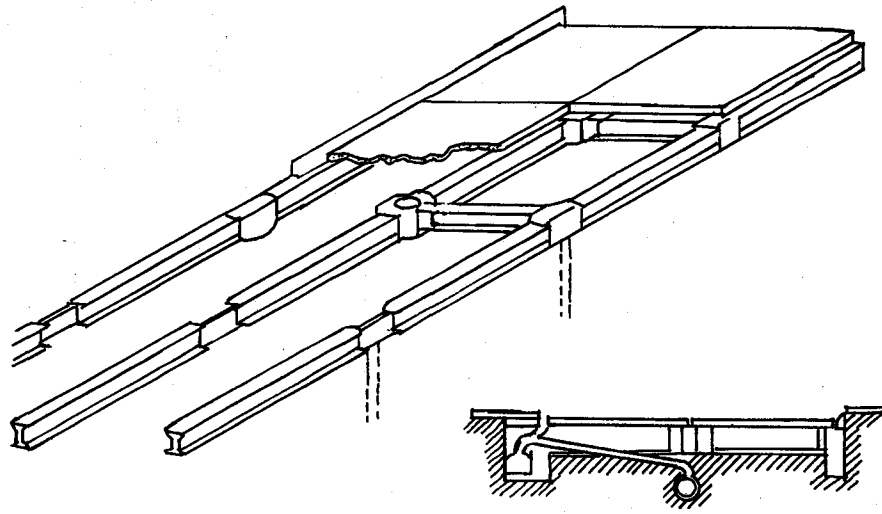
PREFABRICATED SLABS FOUNDED ON LONGITUDINAL AND TRANSVERSE BEAMS
